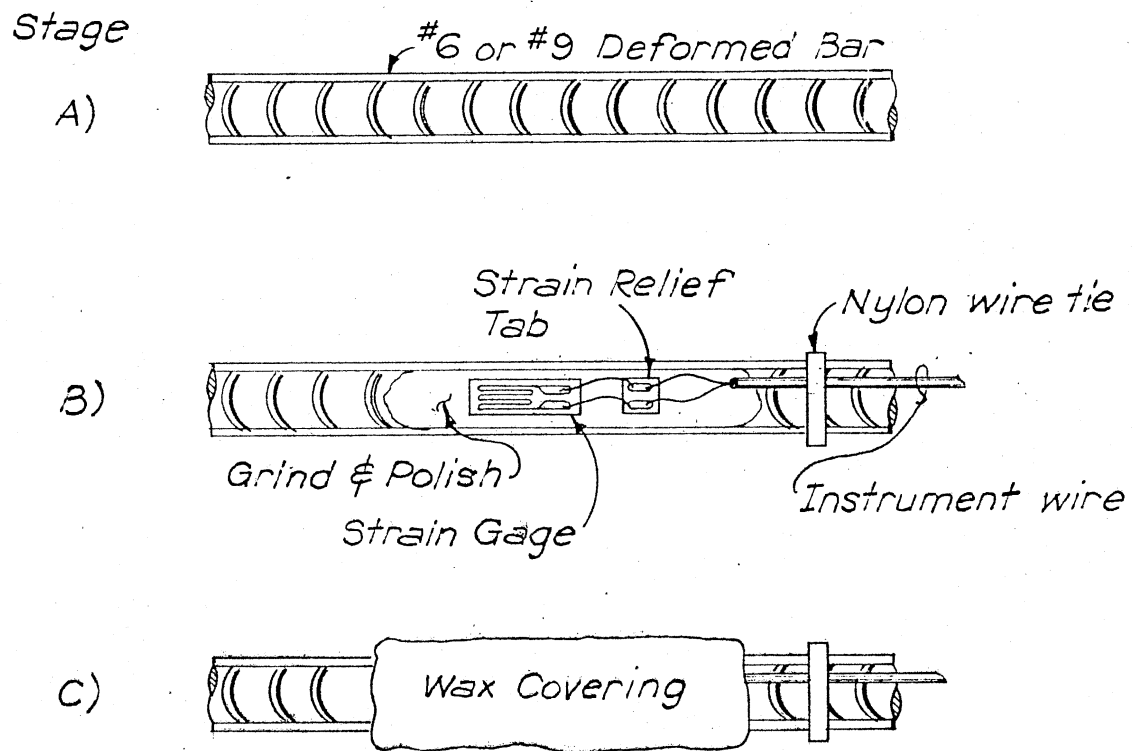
Typical Strain Gage Installation on Reinforcing Steel
